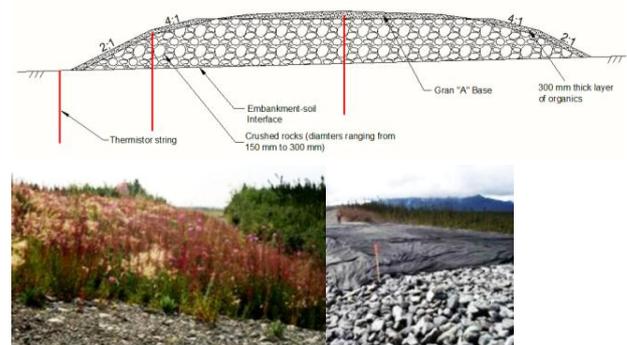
Air convection embankment at Beaver Creek, Yukon: a) schematic of air convection embankment (top); b) geotextile implementation (right) and organics on the west slope of embankment after 1 year of construction (left).
